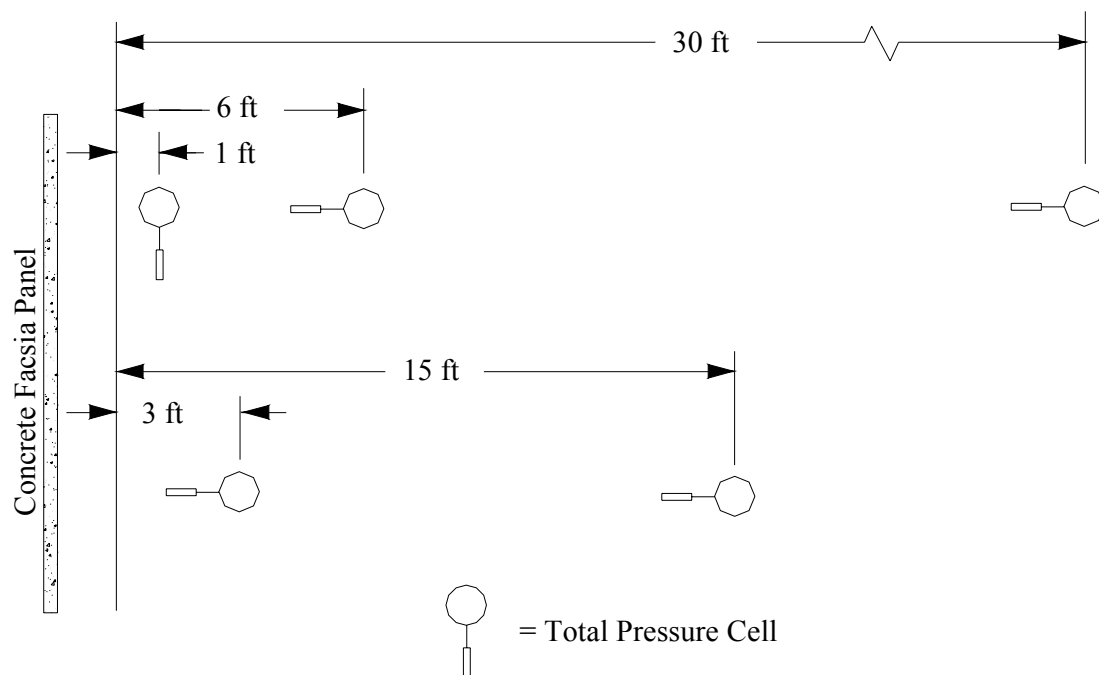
Plan view of the instrumented section with total pressure cells.
